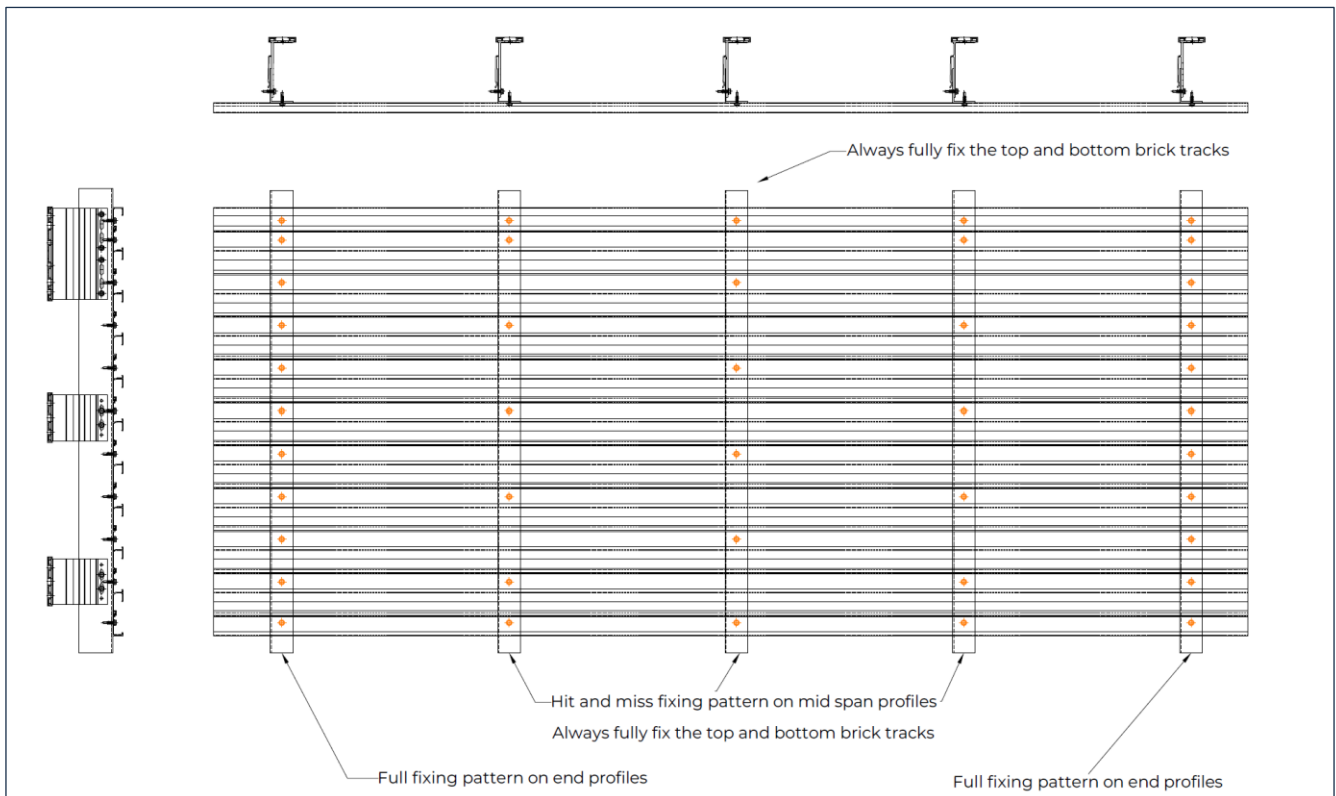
Typical fixing pattern used for fixing Briklok profiles to vertical or horizontal support profiles.
